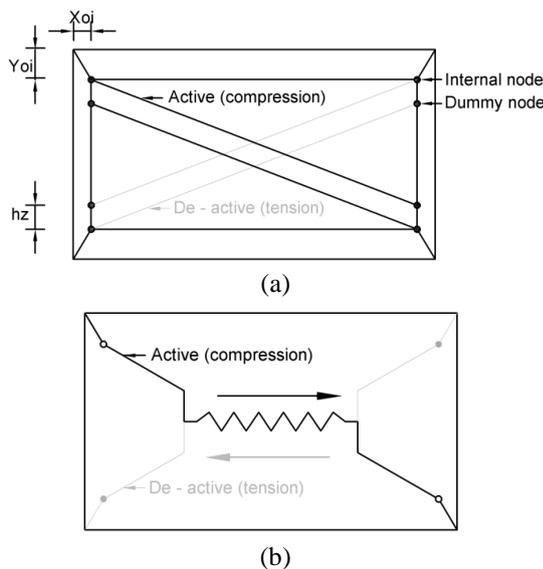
Infill panel element proposed by Crisafulli (1997). (a) Compression/Tension Struts, (b) Shear Strut
